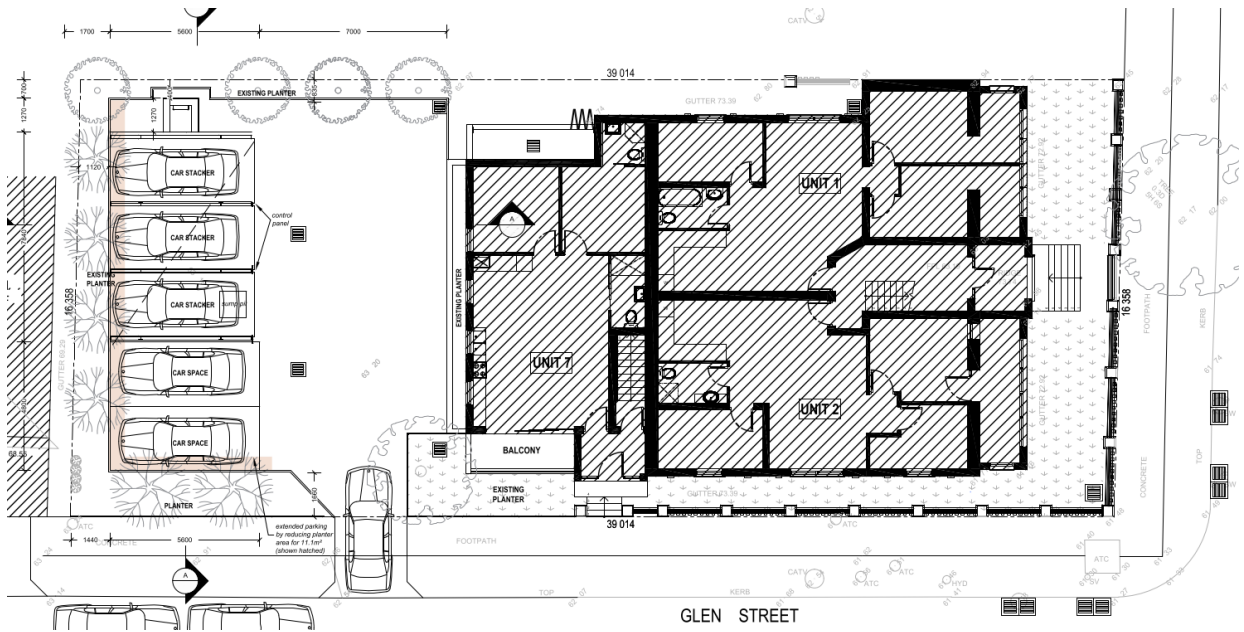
DA-392/2022 Proposed Ground Floor Plan
